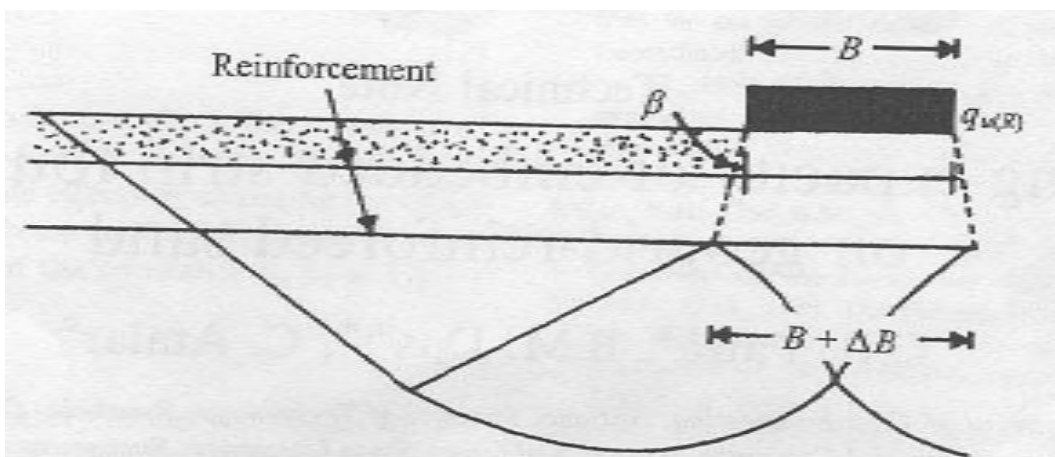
Wide-slab failure mechanism in reinforced sand supporting a strip foundation (source Huang and Menq, 1997)
